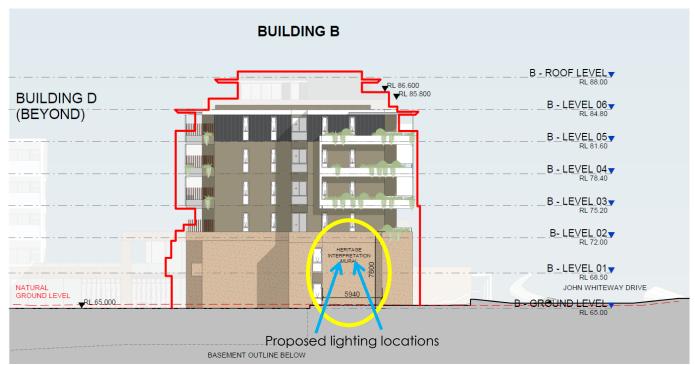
Location of proposed artwork (Source: Modified approved plans, marchese partners)
